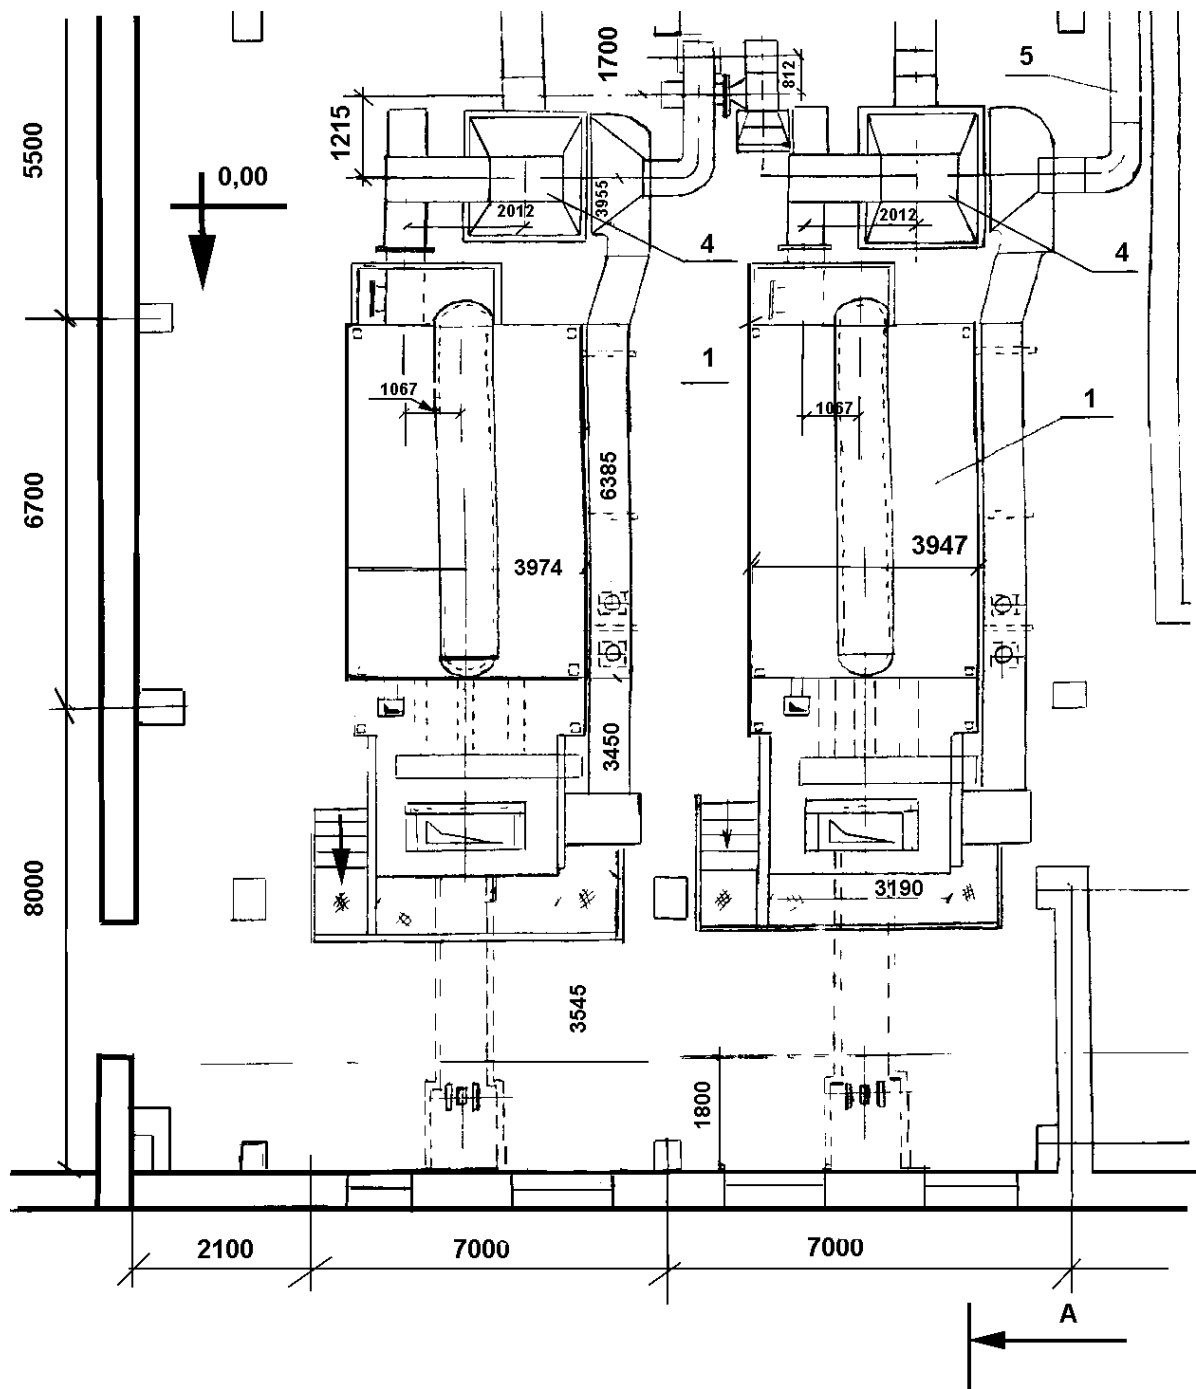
Boiler house at Rehitza Drew Sawmill. Air view on wood fired boilers
